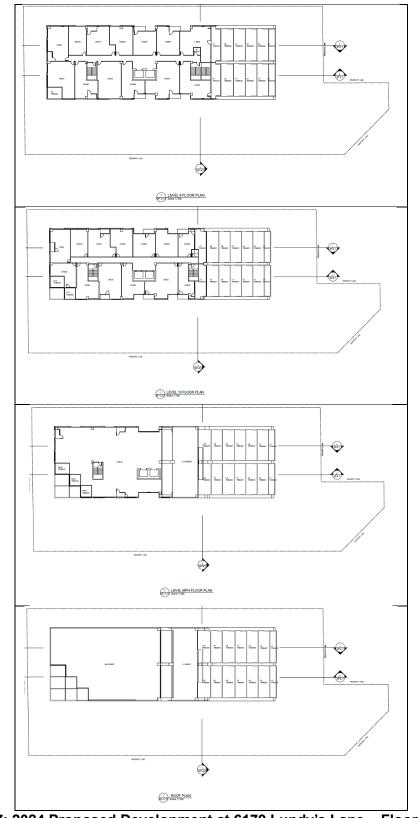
2024 Proposed Development at 6179 Lundy's Lane – Floor 9 - Roof (CY Lee Architects Ltd. 2024a)
